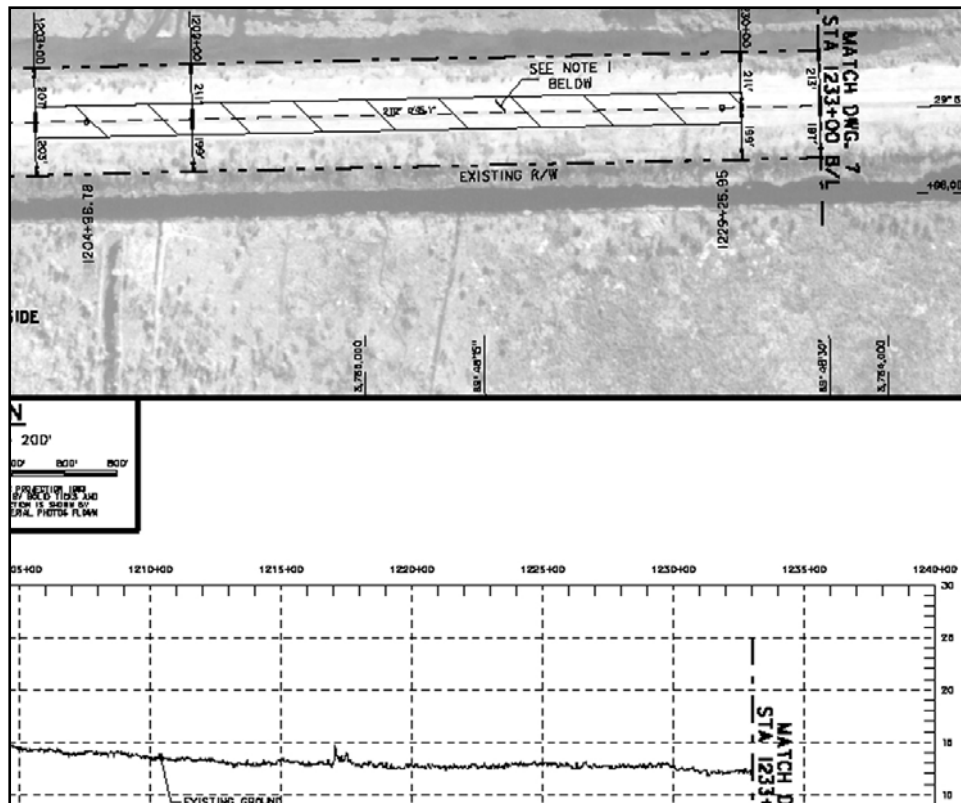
Levee Crown Elevation Drops from Elev 15 ft to Elev 12 ft in the Scour Area. Elevation 12 ft remains fairly constant along the reach for about a mile beyond the scour section. From Contract Solicitation STB08 W912P8-06-R-0094, drawing sheet C-06
